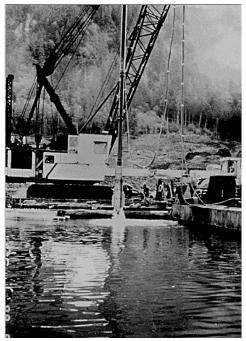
Vibrator suspended from a barge-mounted crane.
